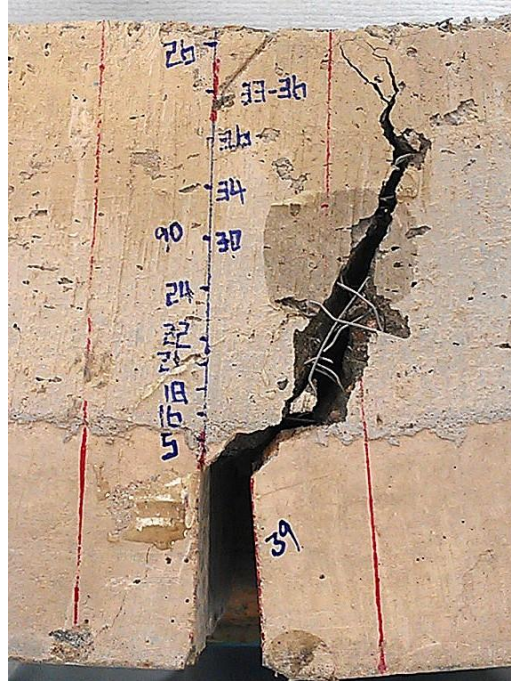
Failure Cracks in PVAPMC Compo. Beam 1
